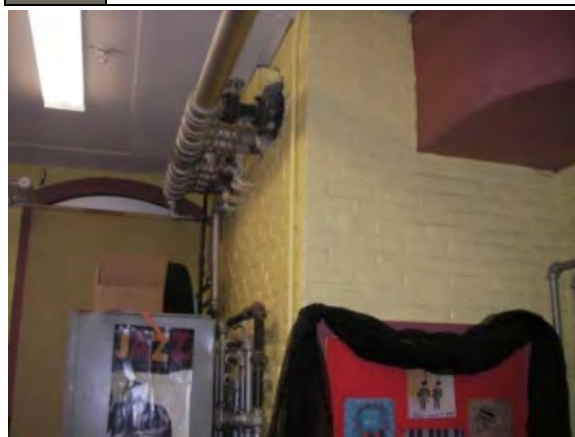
1902 BUILDING BASEMENT MUSIC ROOM STEAM PIPING
